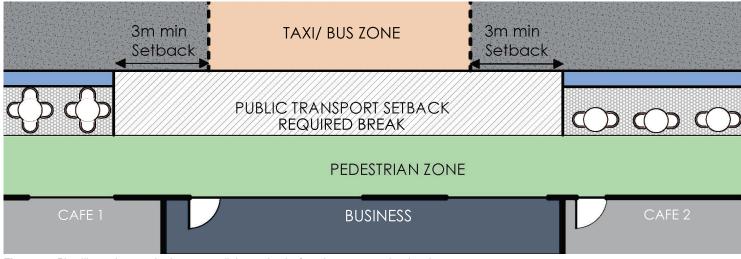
Plan illustrating required on-street dining setbacks from bus stops and taxi ranks.
